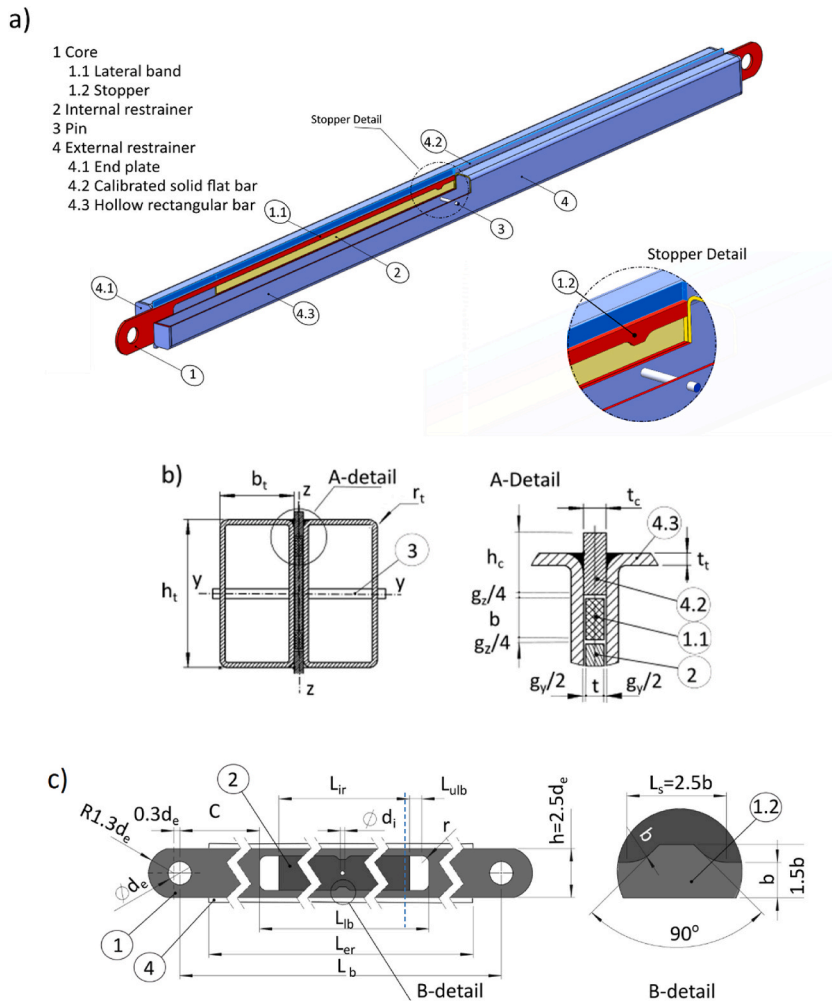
SC-BRB assembly and geometry of parts: a) Parts' assembly; b) Brace cross-section; c) Core and internal core, with geometric detail of the stopper.
